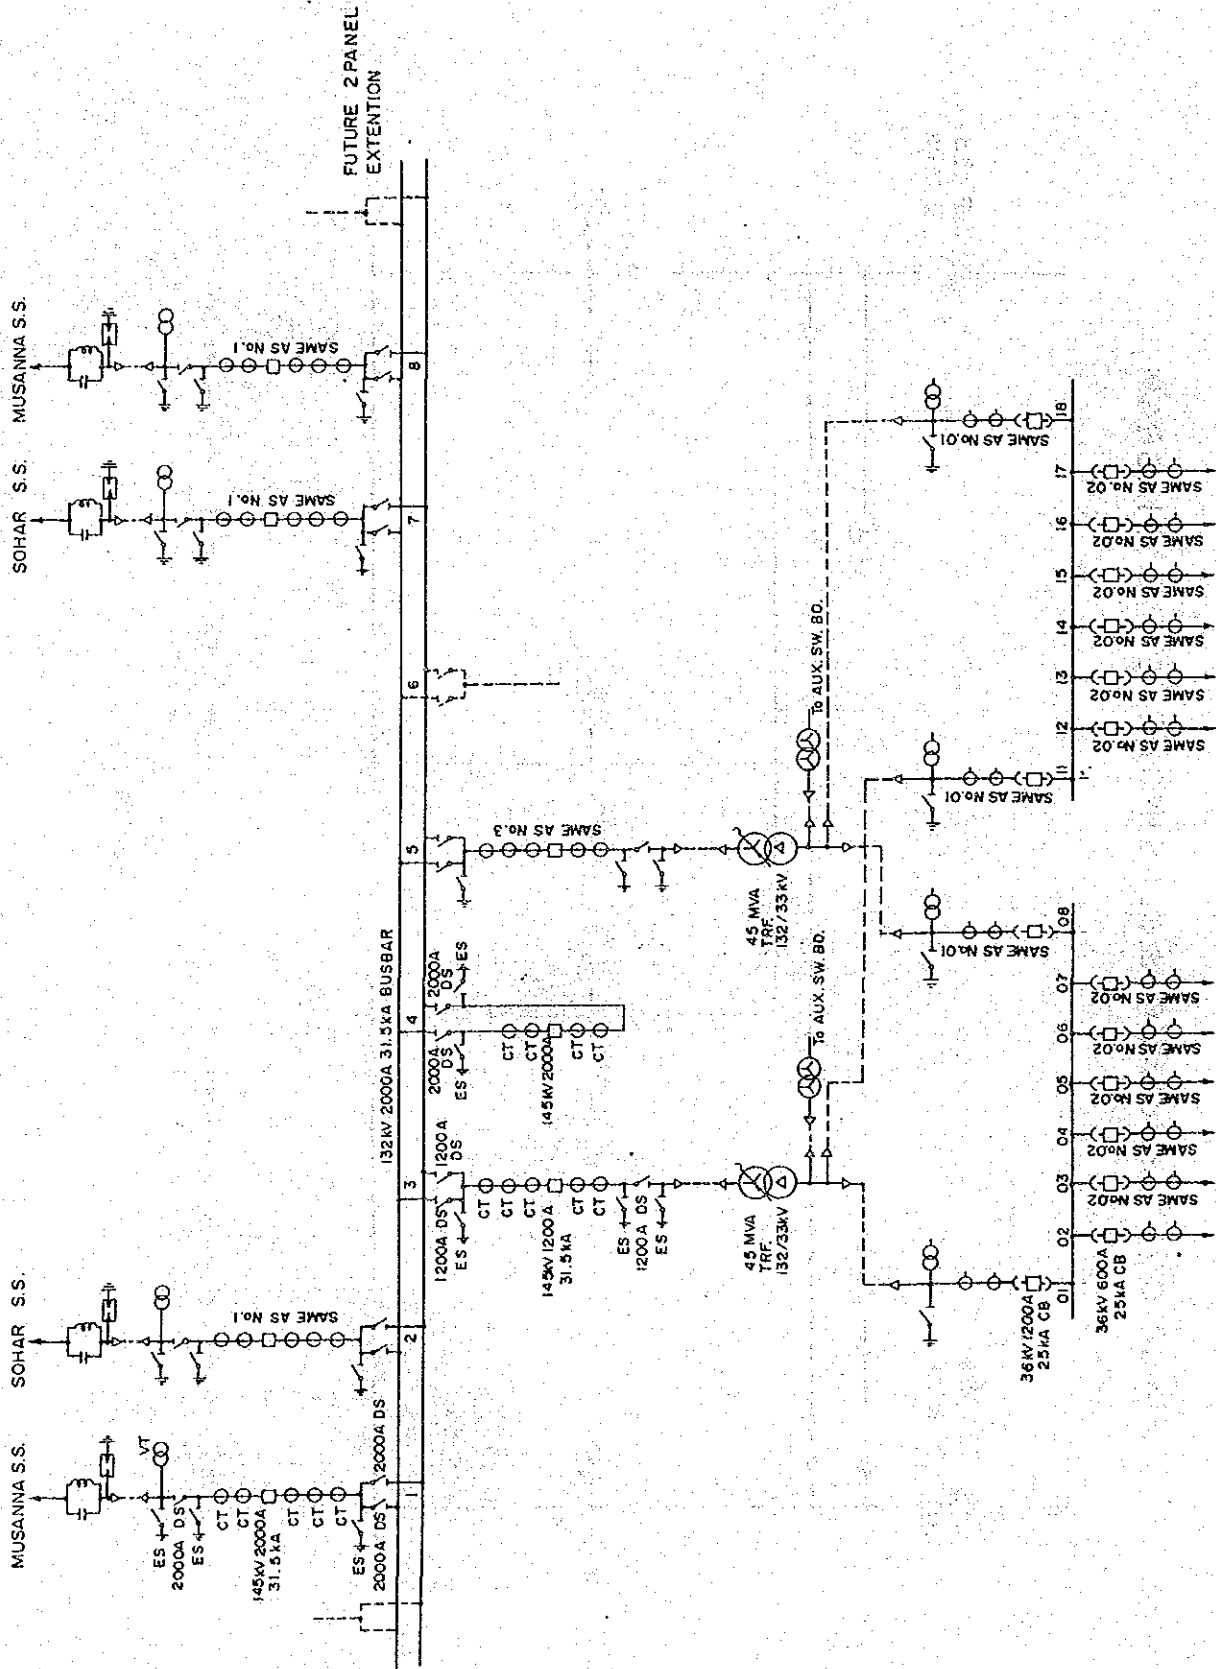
LAYOUT FOR BARKA 275/132/33KV SUBSTATION
